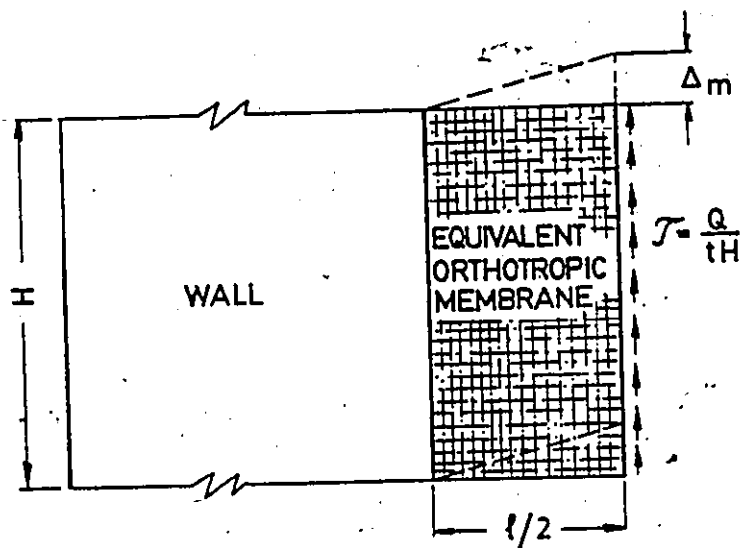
MODELLING OF WALL-FRAME STRUCTURE - KHAN AND STAFFORD-SMITH [61]
